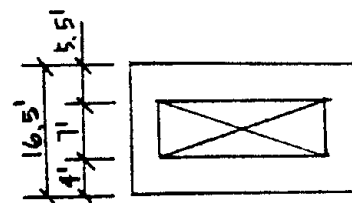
Calculations for Typical Wall Panel Stiffness, 490 Jarvis Drive Building
